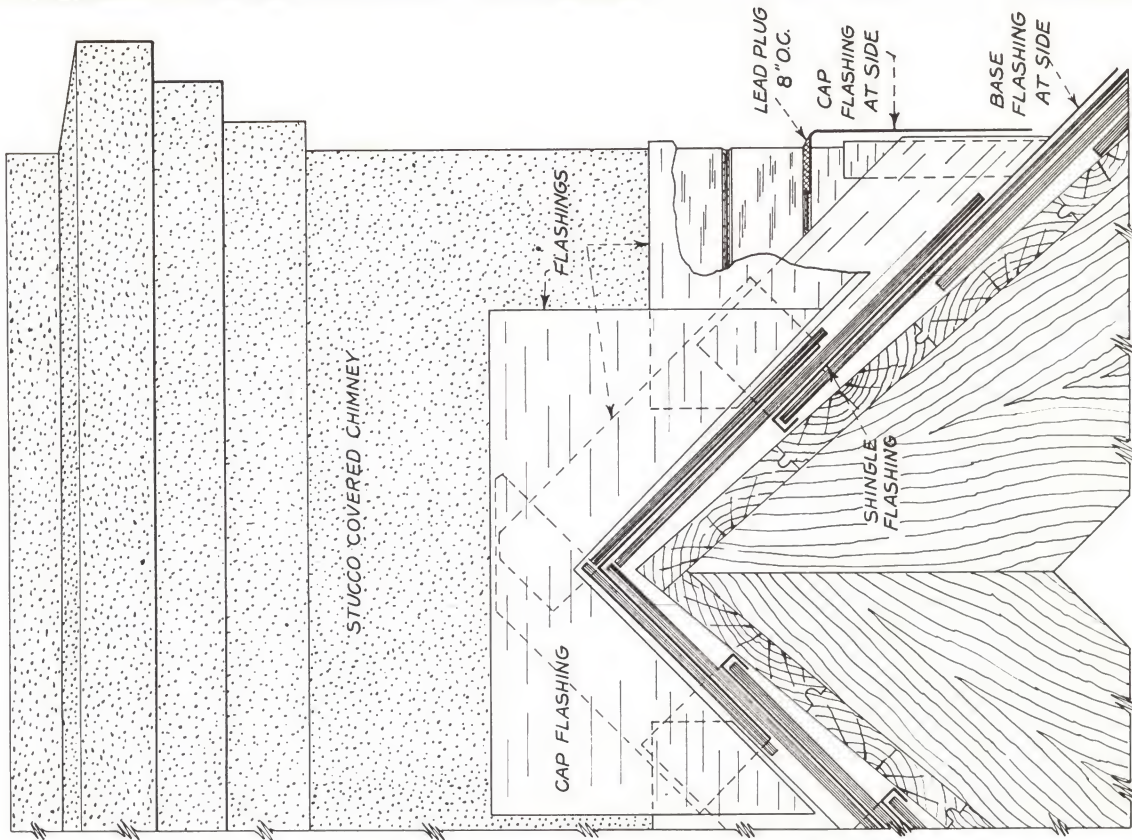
SECTIONAL VIEW SHOWING APPLICATION OF FLASHINGS TO ROUGH BRICK CHIMNEY COVERED WITH STUCCO - SCALE 2"=1'-0"
